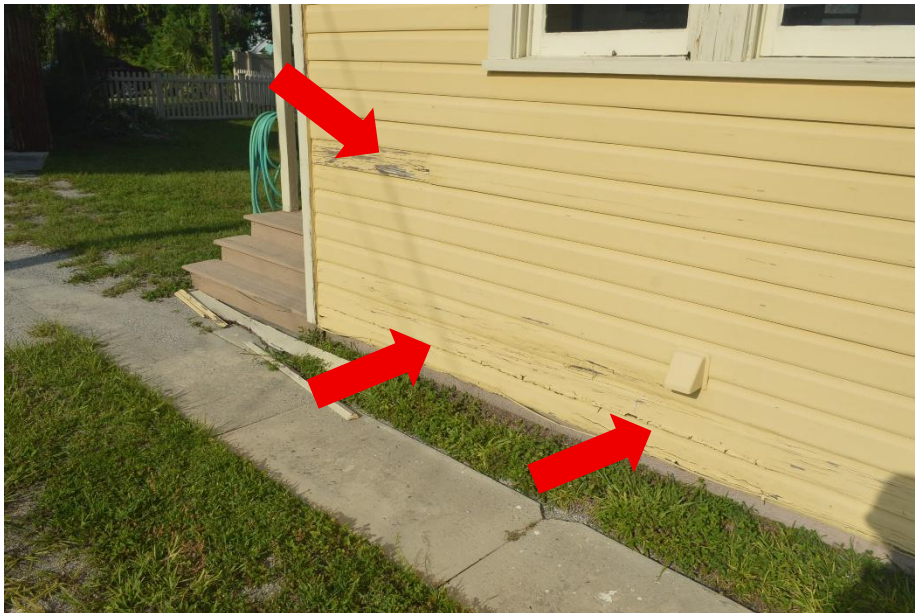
Damaged/Rotted Exterior Wood Siding (East Elevation)
